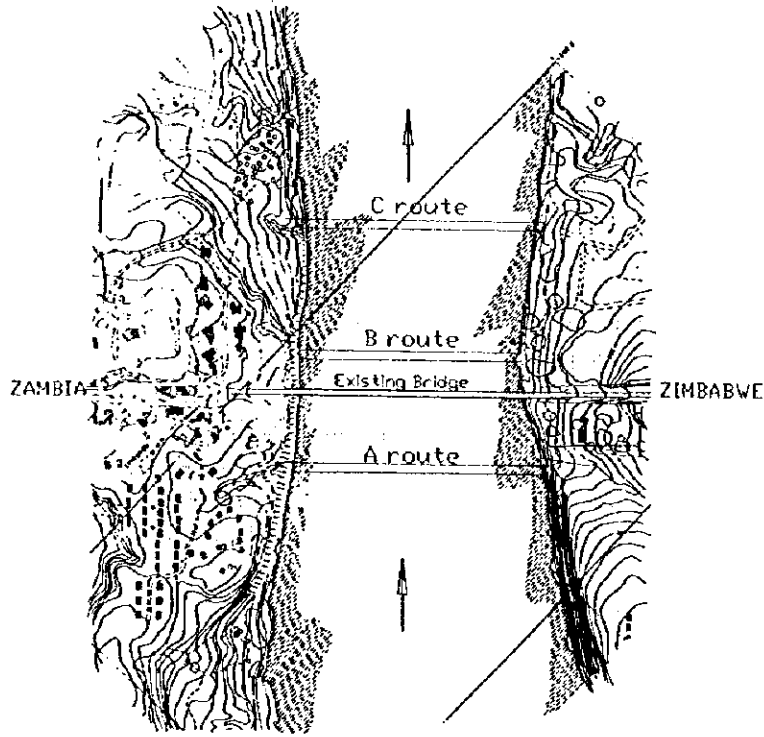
Bridge Site at Chirundu (Zimbabwe)
